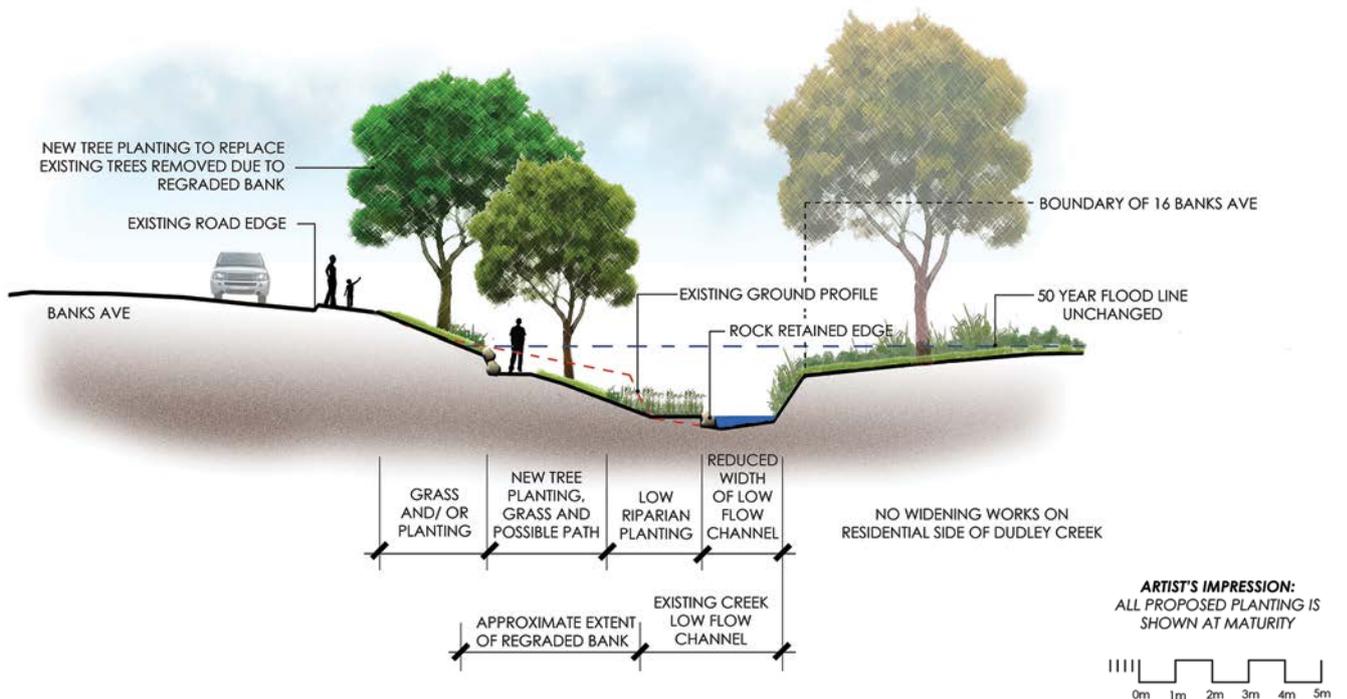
Downstream Option A – Cross Section B (looking downstream from 24 Banks Avenue)
